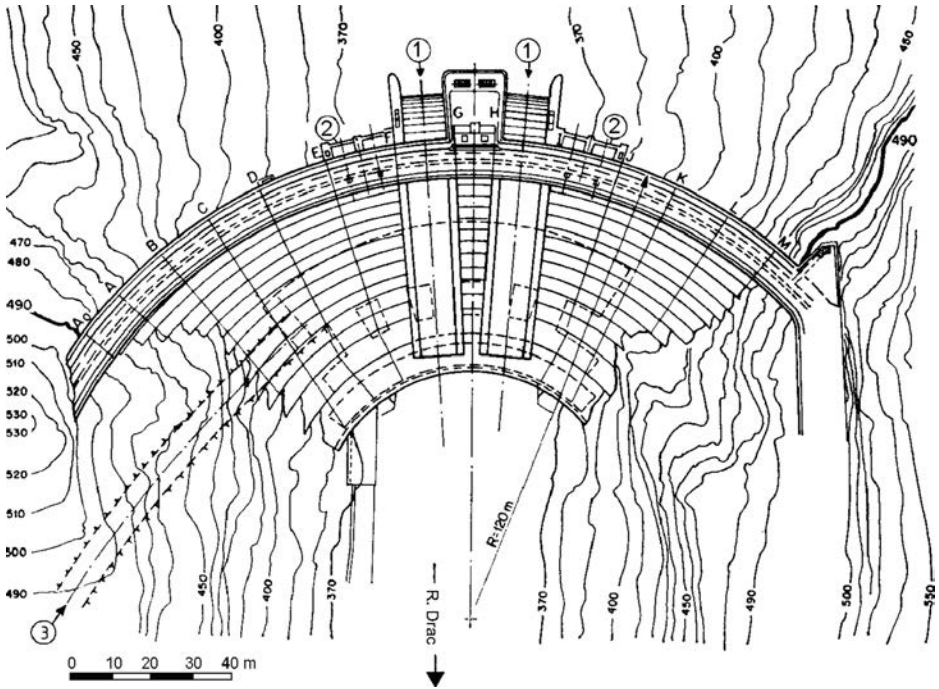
Locality plan of Monteynard Dam (France). (1) Spillway; (2) intake; (3) access tunnel.
